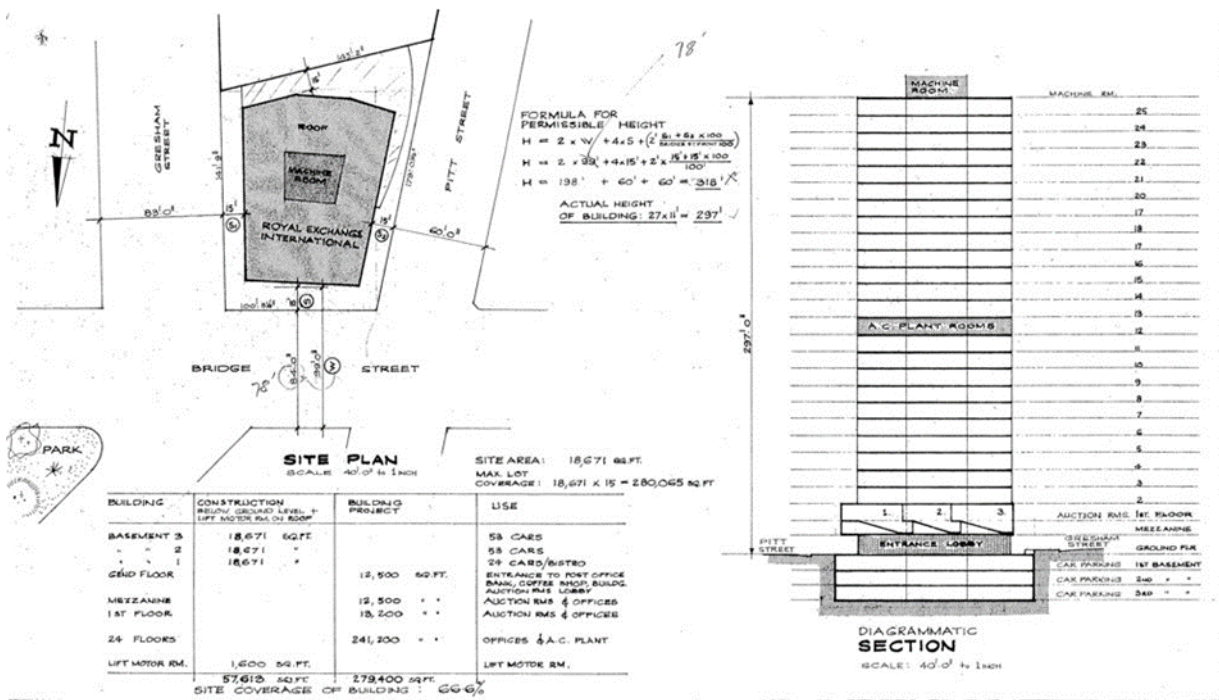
Site plan and sectional drawing of building at 56 Pitt Street.
